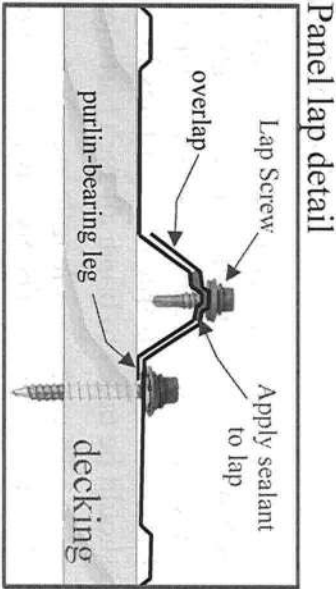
Butyl tape or caulk is required when the roof pitch is 3/12 or less, with lap screws applied every 2 feet to maintain water-tightness of the lap. On pitches greater than 3/12, lap screws and butyl tape are optional. For more details on screws, see pgs. 6 and 7.
